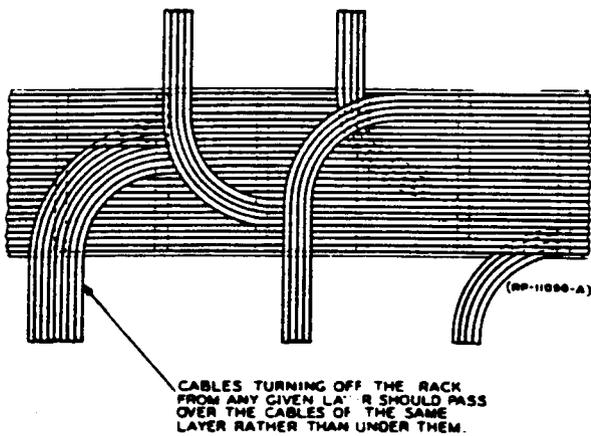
TURNING CABLES FROM CABLE RACKS (PARS. 3.41 AND 3.42)
